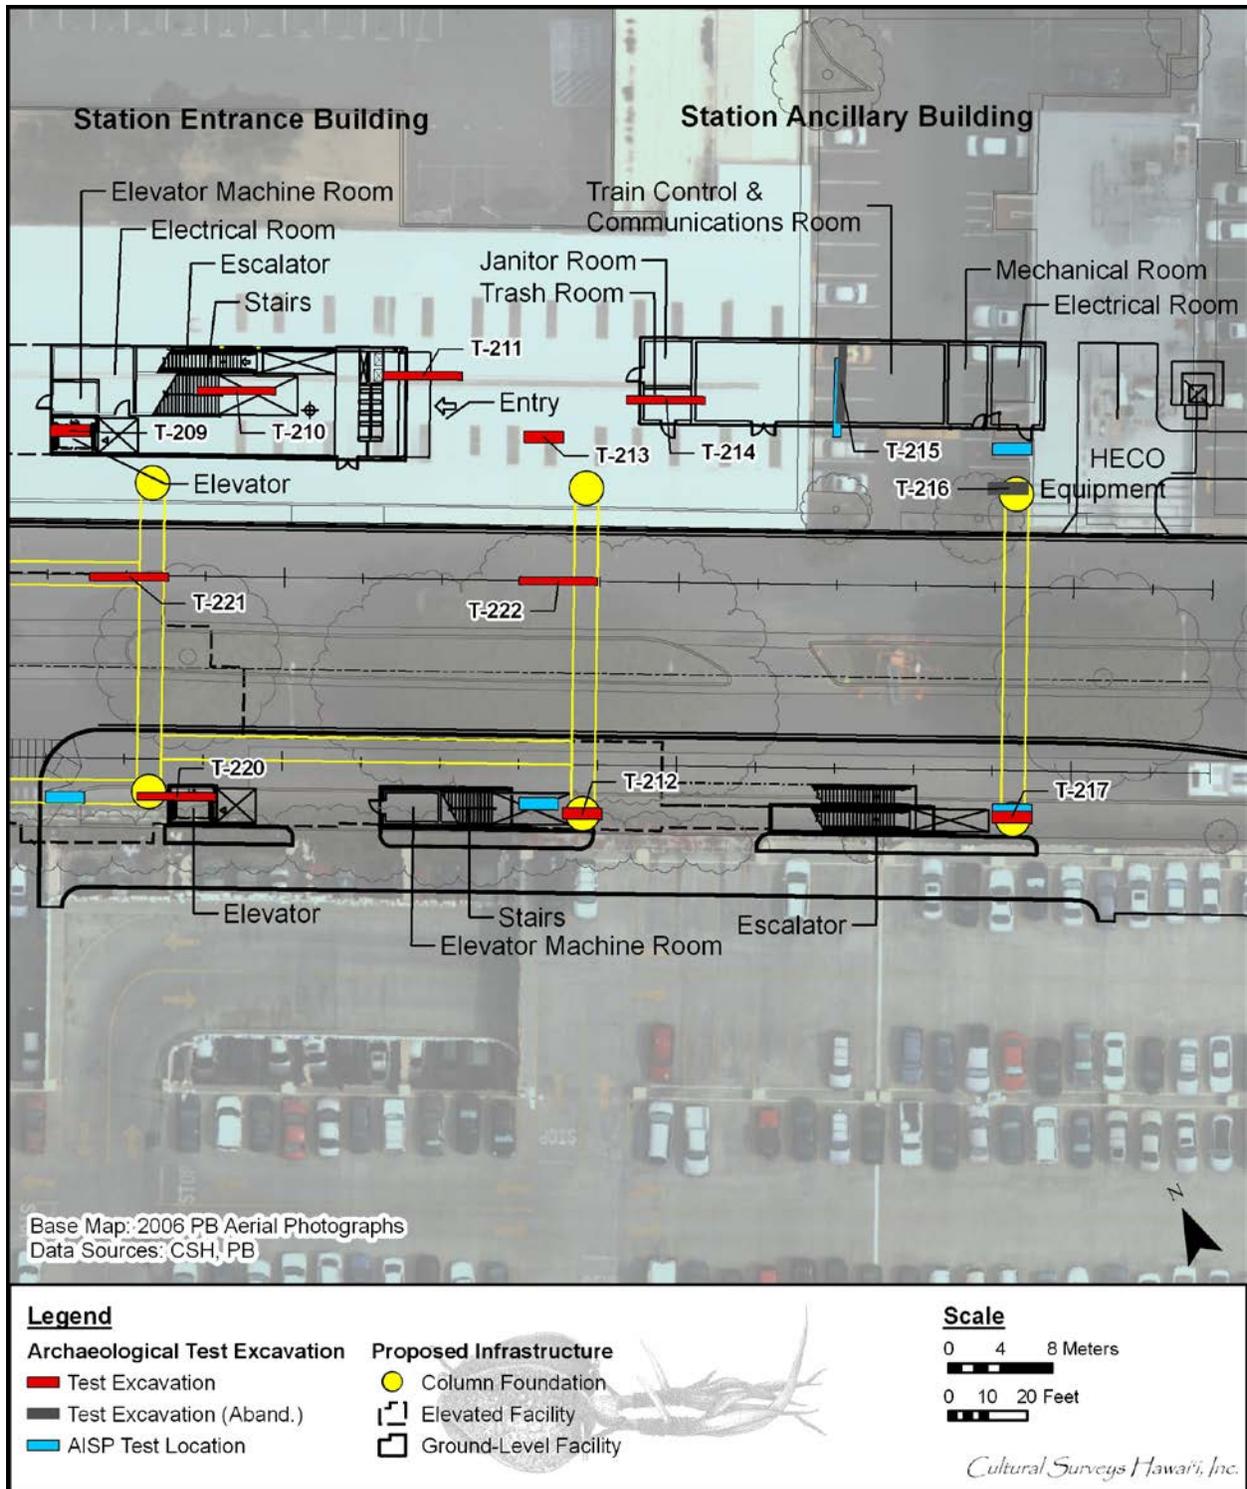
Ala Moana Center Station, detail of (*mauka*) Station Ancillary Building foundation layout and Station Entrance Building foundation layout showing locations of proposed AISP and actual AIS test excavations
